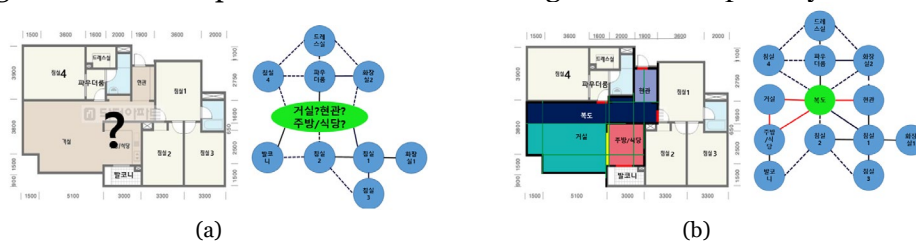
Dividing Indoor Space by Text: (a) An original floor plan and IndoorGML diagram; (b) The divided floor plan and IndoorGML diagram
